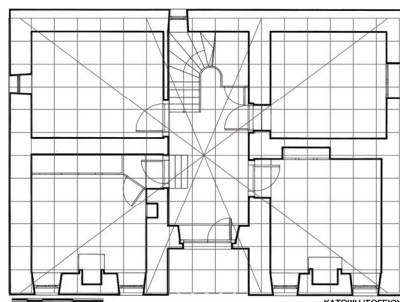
Ground floor plan of Golitsis Mansion in Oxia, Mount Vitsi
